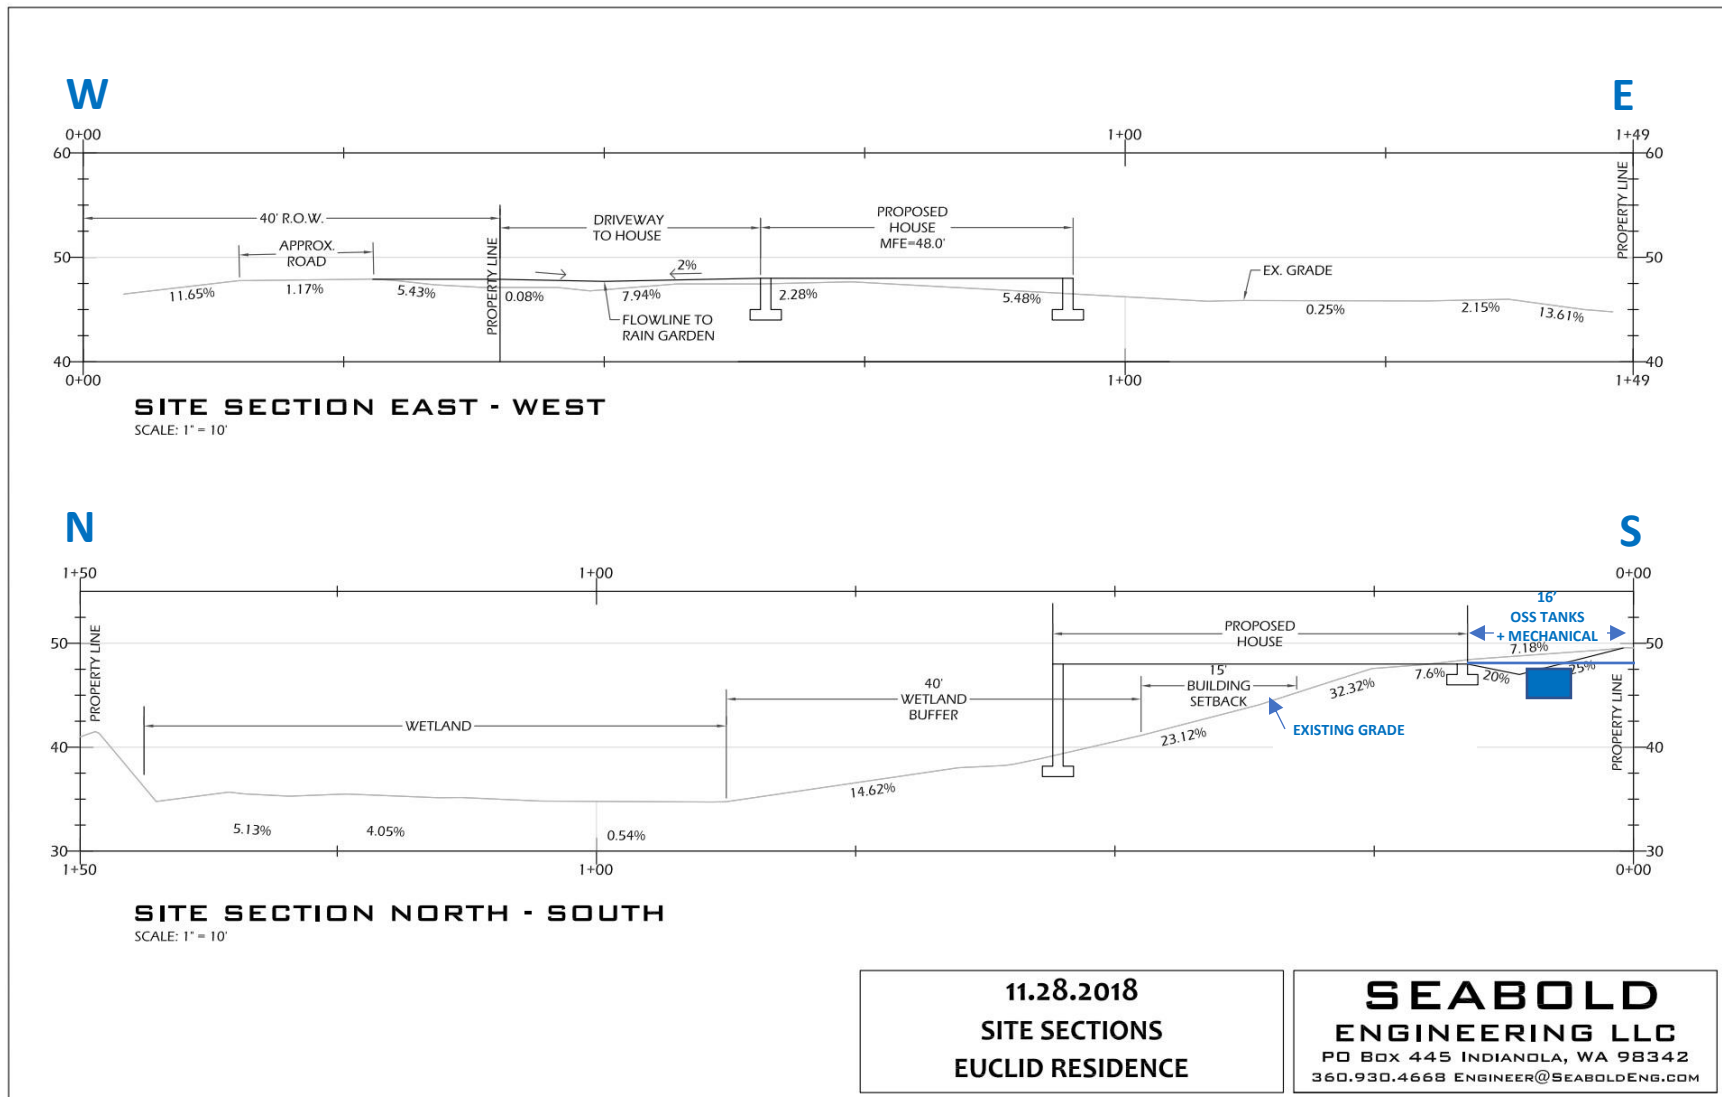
PROPOSED SITE DEVELOPMENT CROSS SECTIONS
